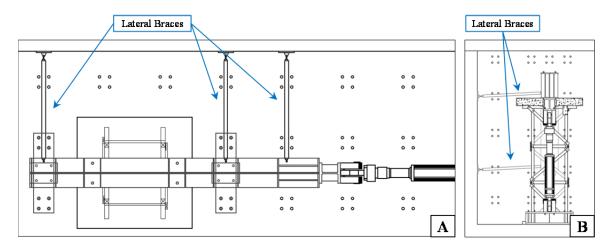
Locations of Lateral Braces A) Plan View B) Side View
